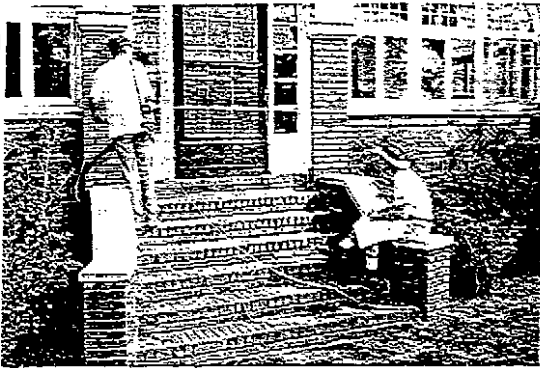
Documenting the building's history, preparing schematic plans, and assessing the condition of the building will provide necessary information on which to set priorities for stabilization and repair prior to securing the building. Photo: Frederick Lindstrom, HAAS.
